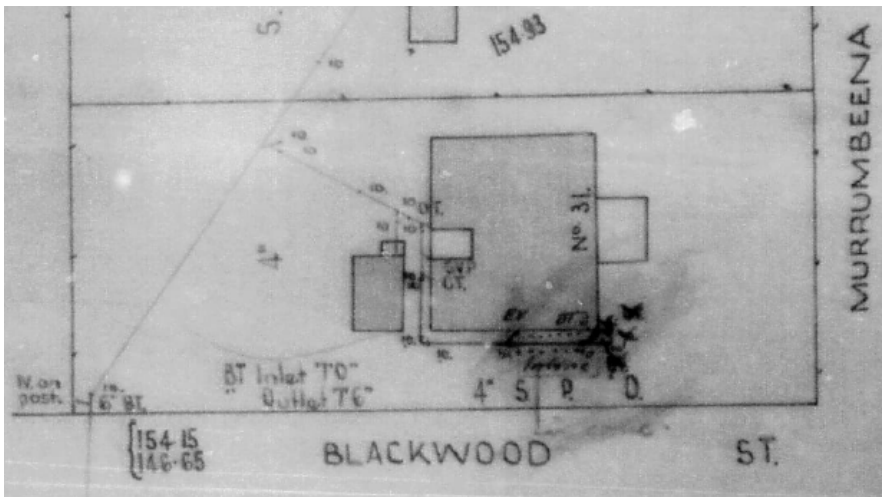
Drainage plan of the subject site dated June 1953, with a footprint of the house and outbuildings, annotated with sewerage works (Source: SEW, Drainage Plan No. 115966)
